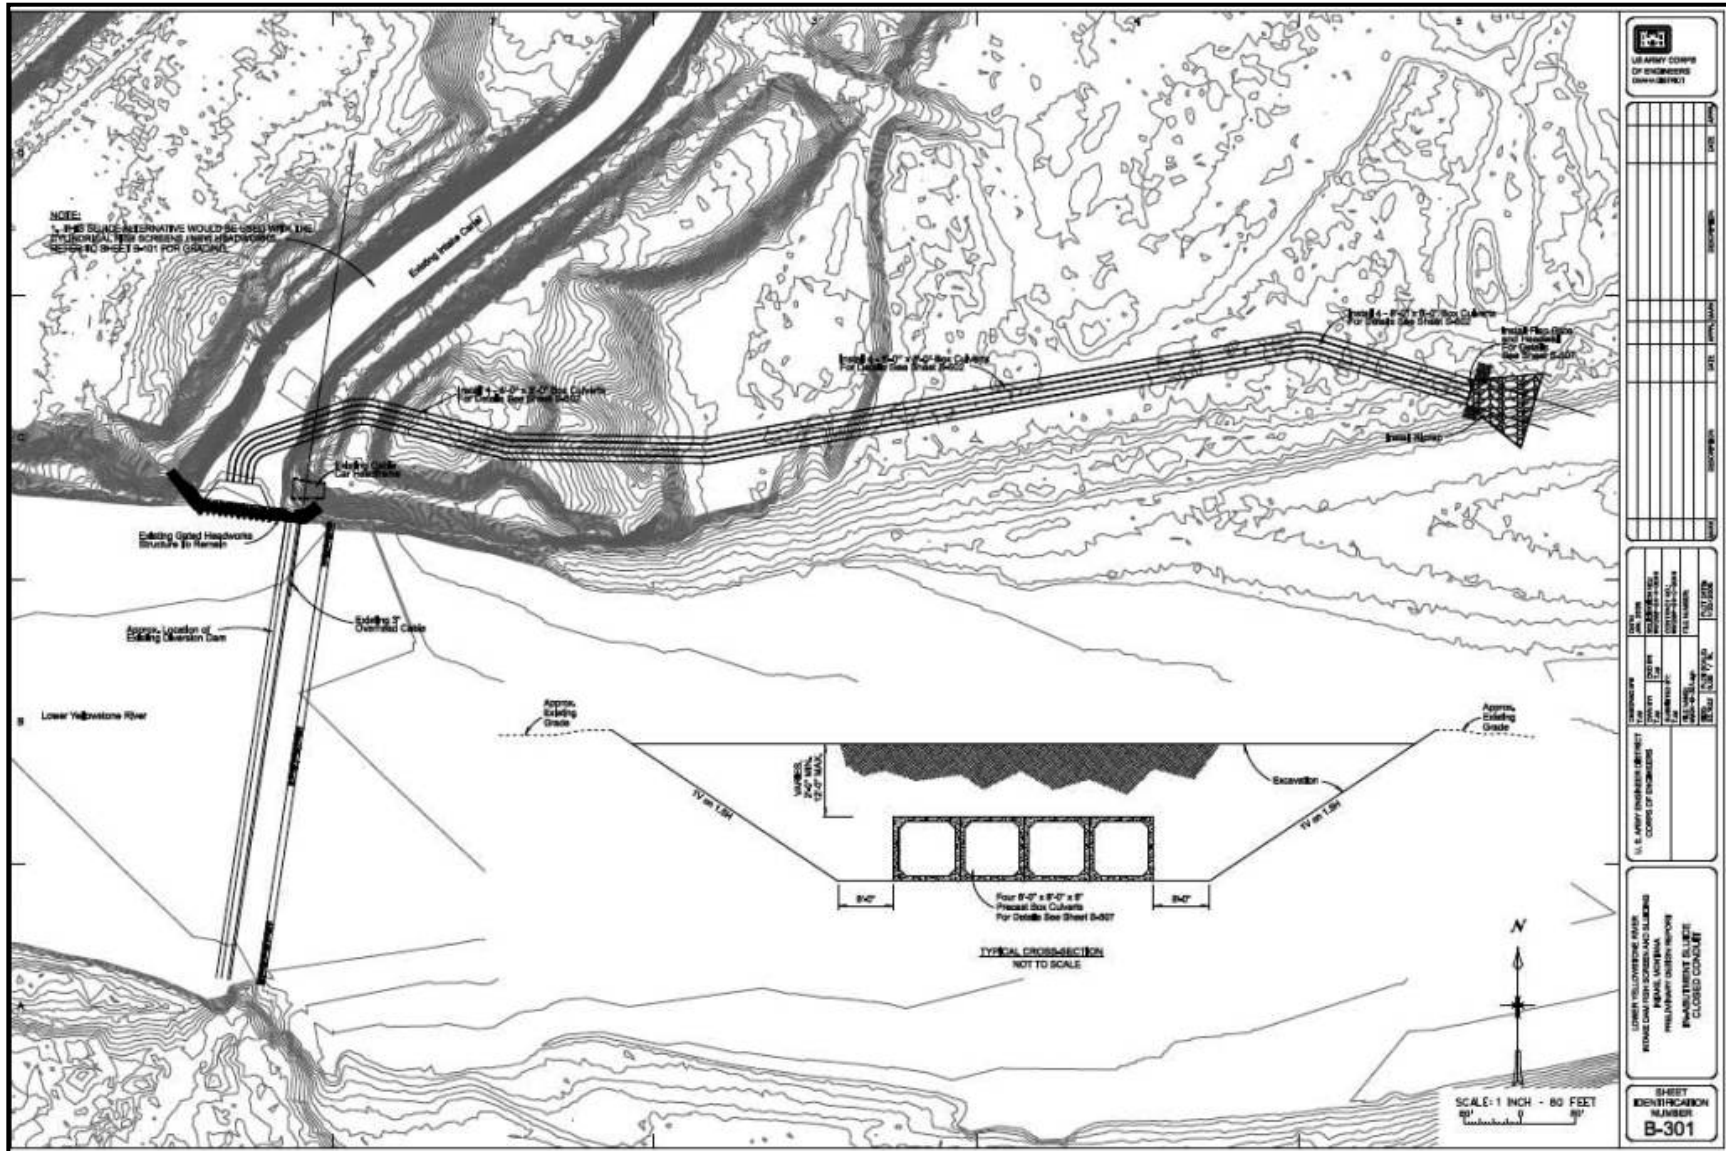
Abutment Closed Conduit Sluiceway Layout.
